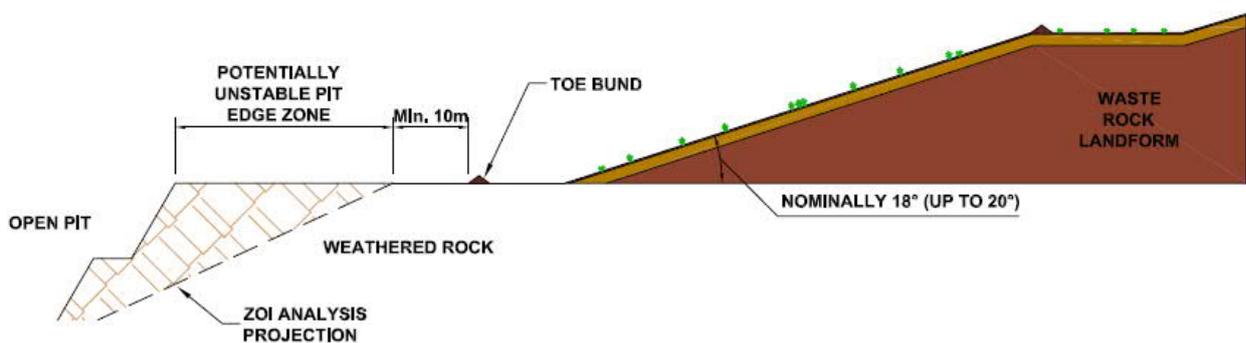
Cross-Section Showing Landform Stand-Off from ZoI Boundary
